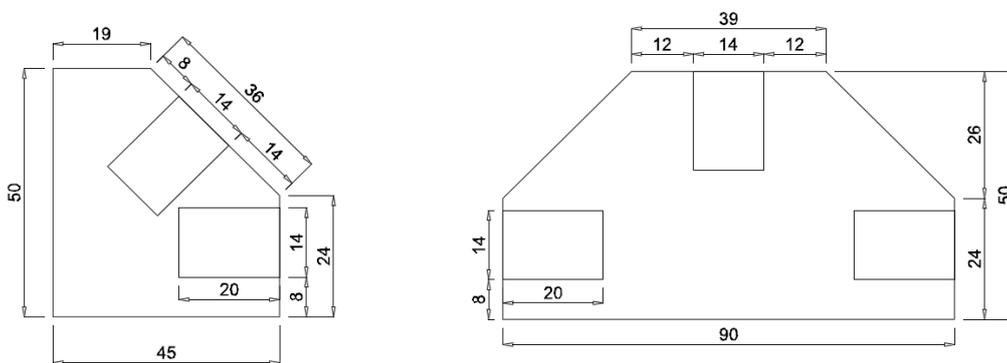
Geometrical details of two types of gusset plates used at the joints, F, L, G-K and B-D
